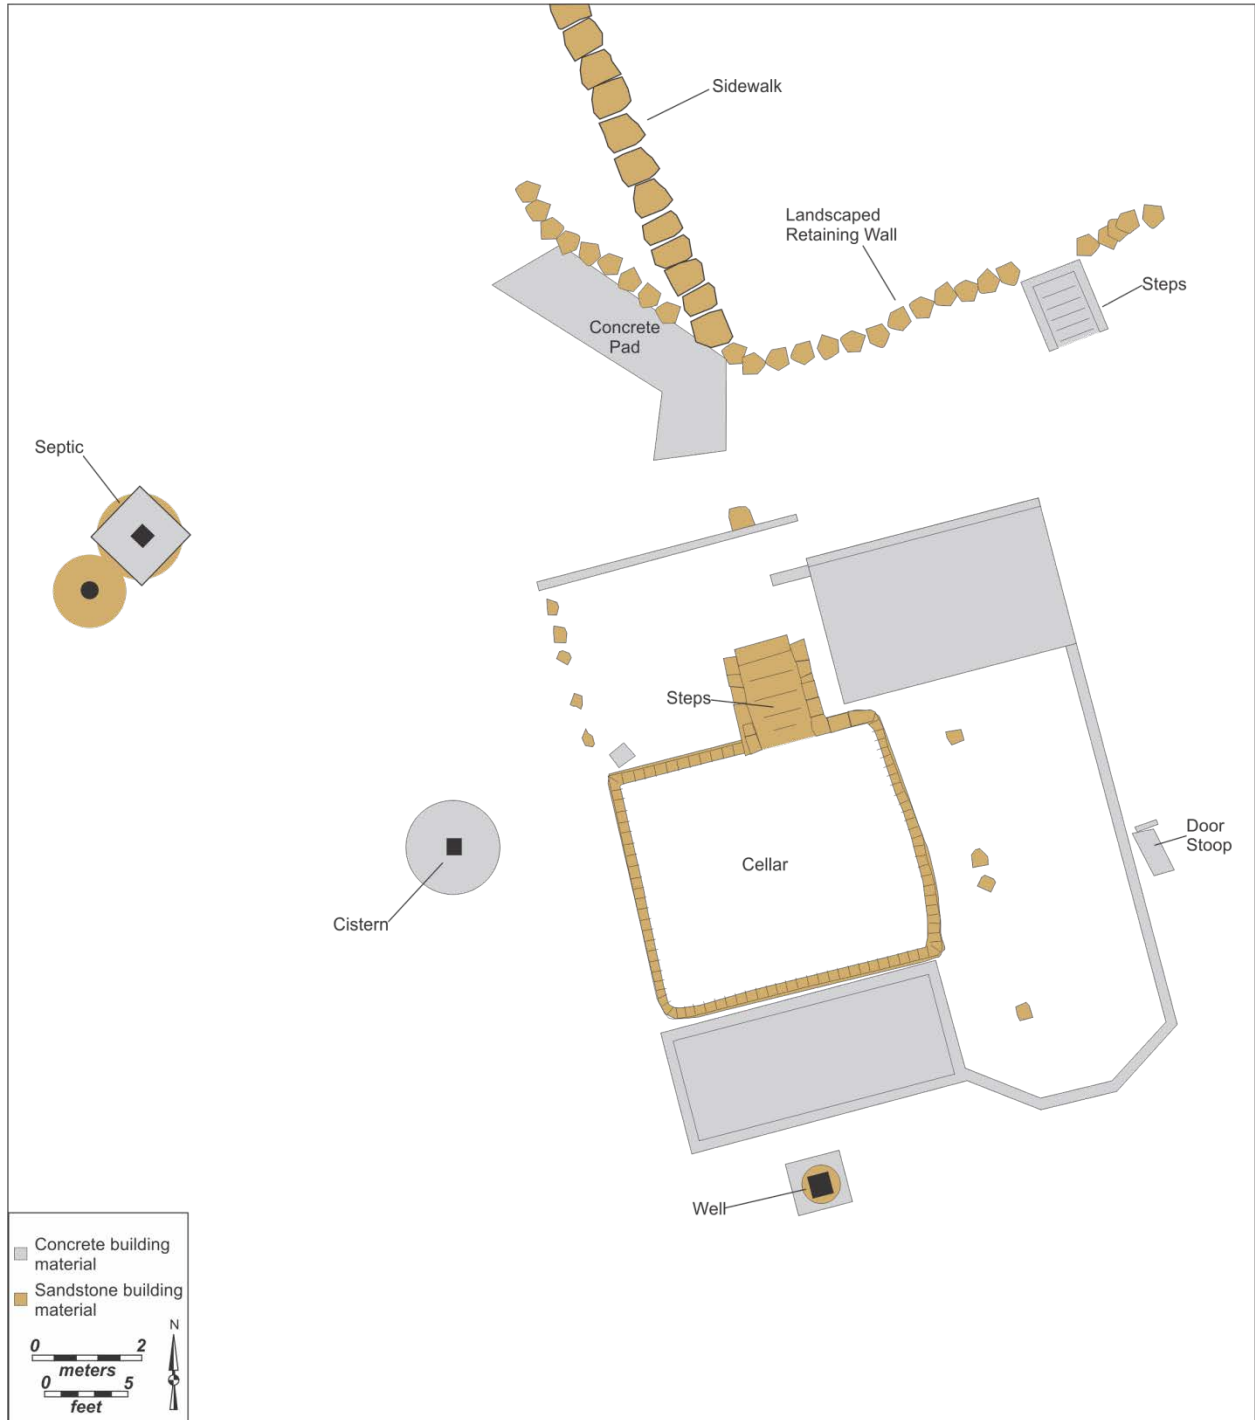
Plan map of the Brodess house foundation (Structure 1).
